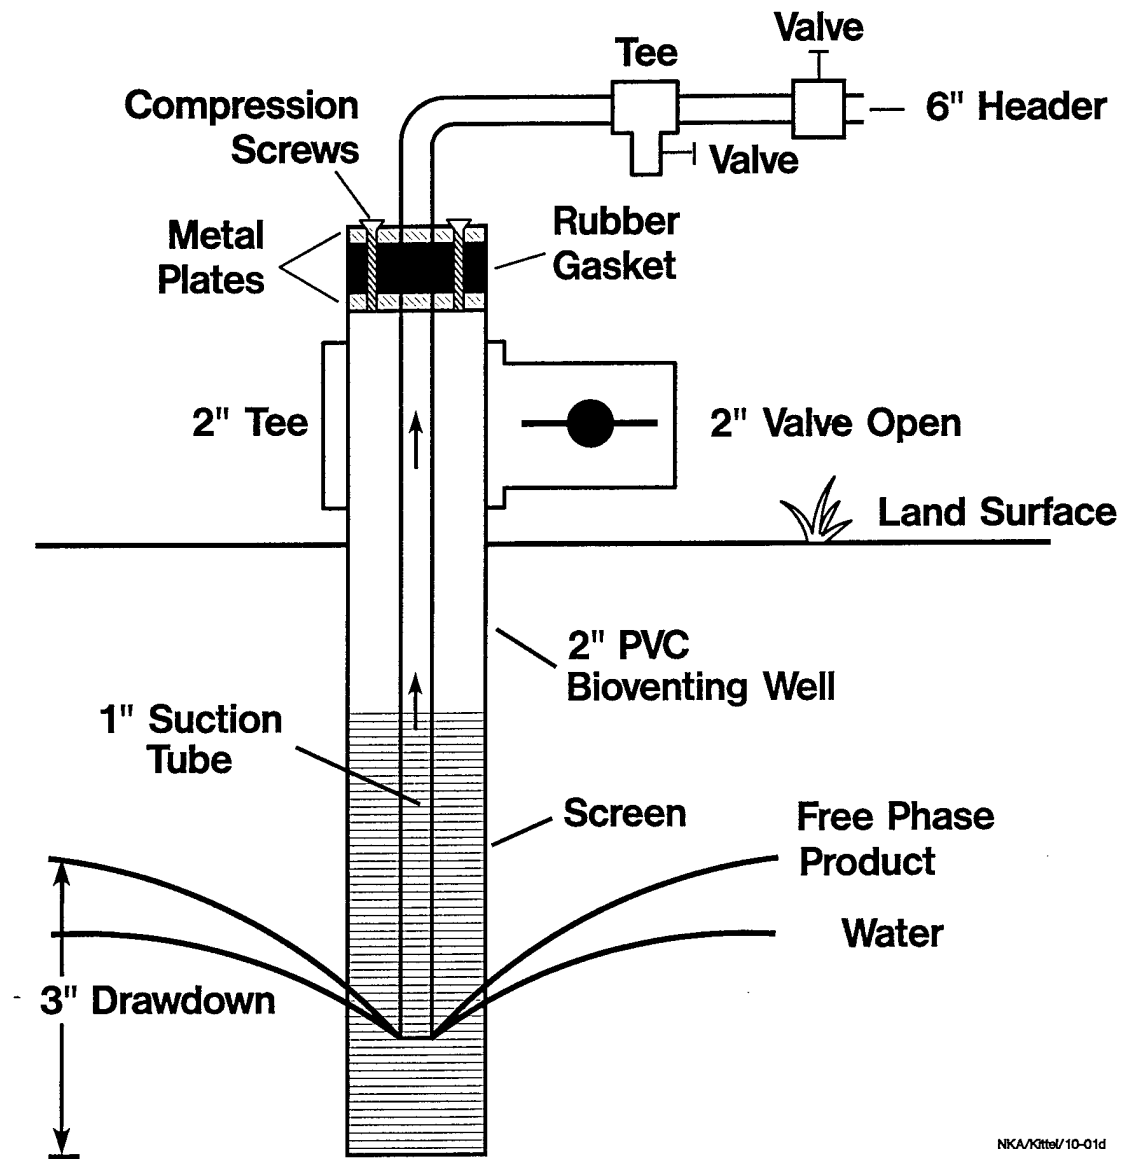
Slurper Tube Placement and Valve Position for the Drawdown Pump Test
